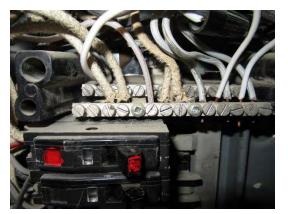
Fabric and vinyl sheeted electrical wiring inside breaker panel
